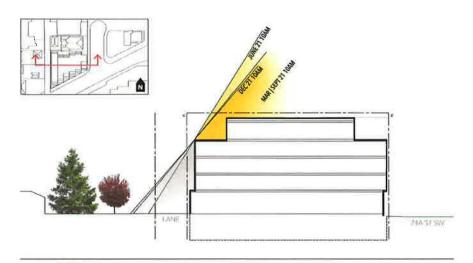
WEST-EAST SECTION (LOOKING NORTH)
